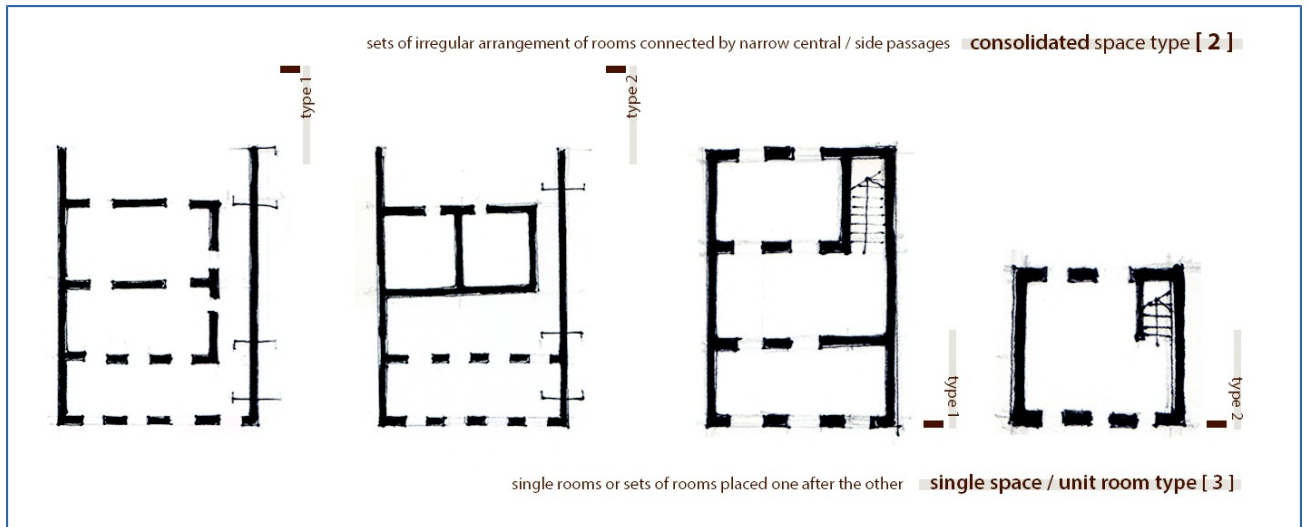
Space Typology of Buildings - Consolidated Space Type and Single Space / Unit Room Type
